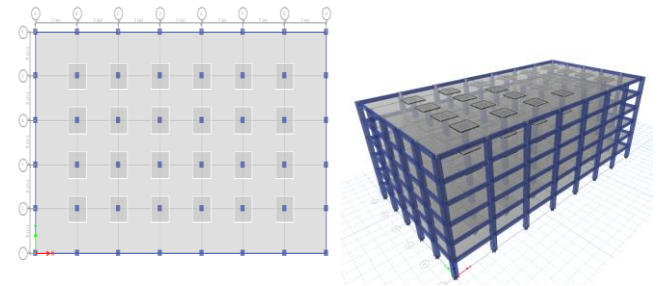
Grid and 3D view of flat slab with drop building (G+5)
